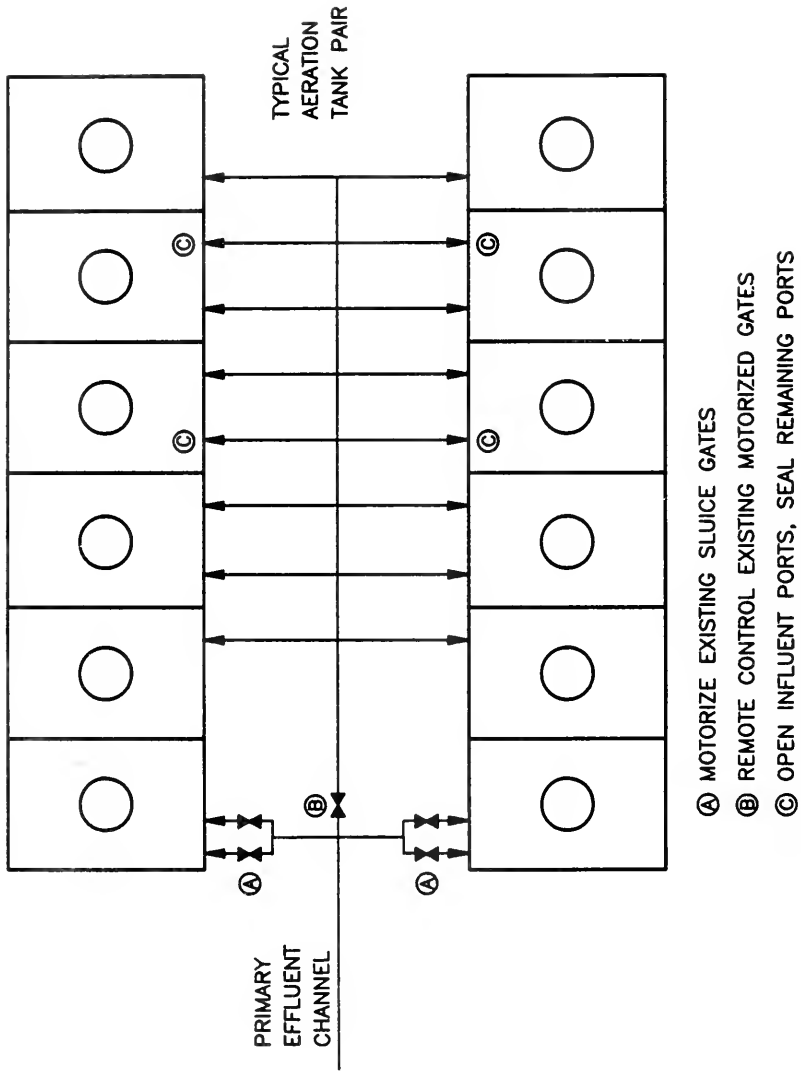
Woodward Avenue North Plant Step Feed Modifications
